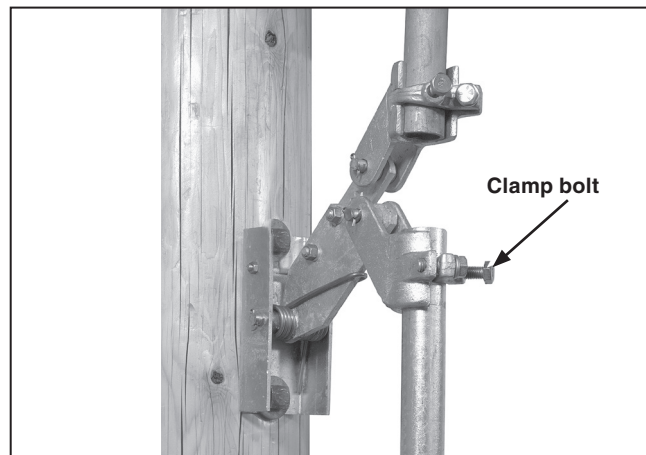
Torquing the clamp bolt at the lowest rod guide (or bell-crank) coupling.
